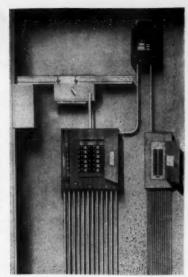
COMPACT ARRANGEMENT of equipment in typical electrical closet shows busway riser and plug-in switch, 277-v fused panelboard, dry-type single-phase transformer, and 120-v circuit-breaker panel for receptacles.
